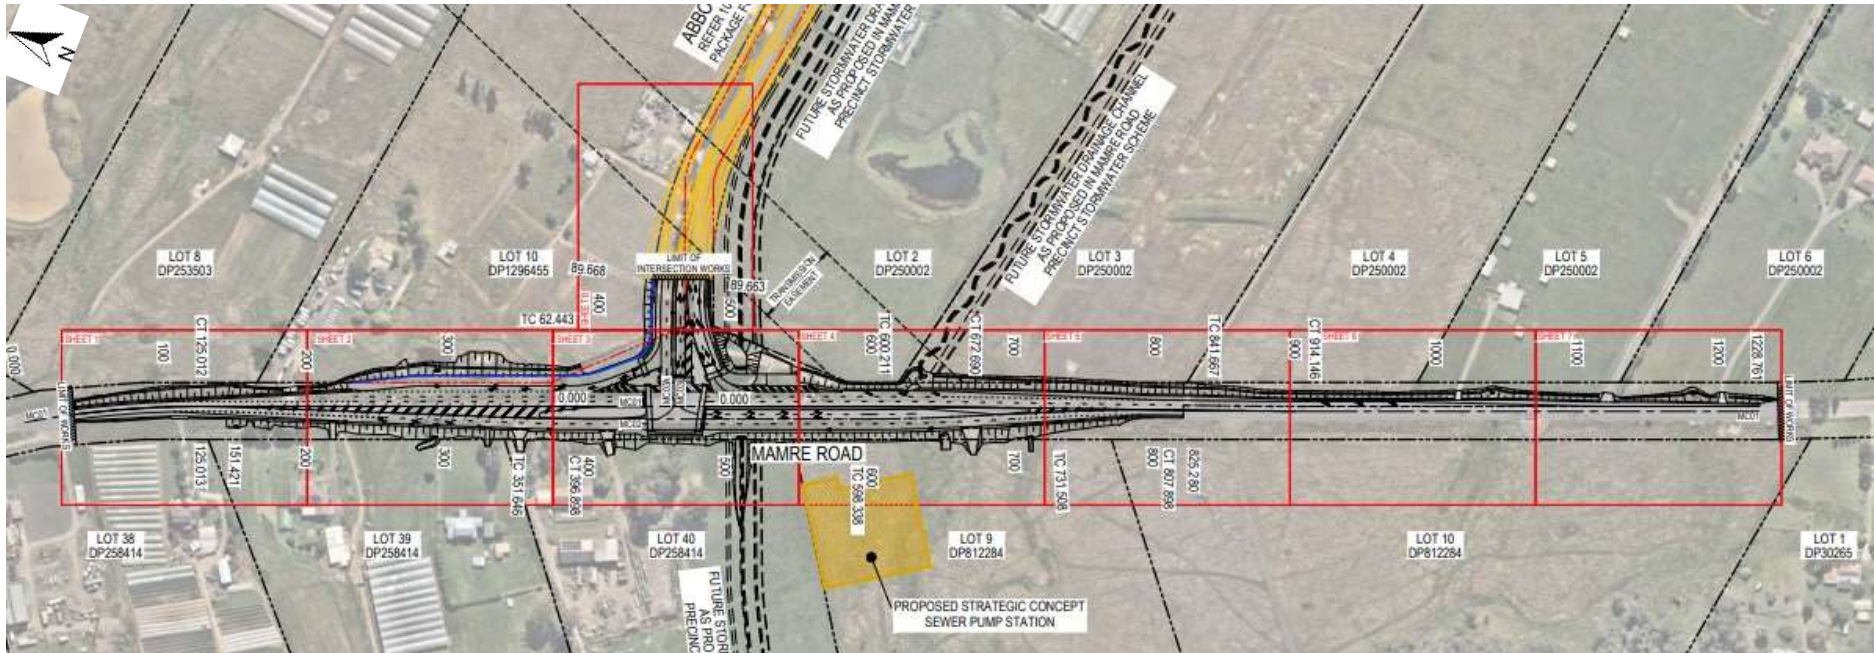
| Extent of Mamre Road / Abbotts Road Intersection Works
